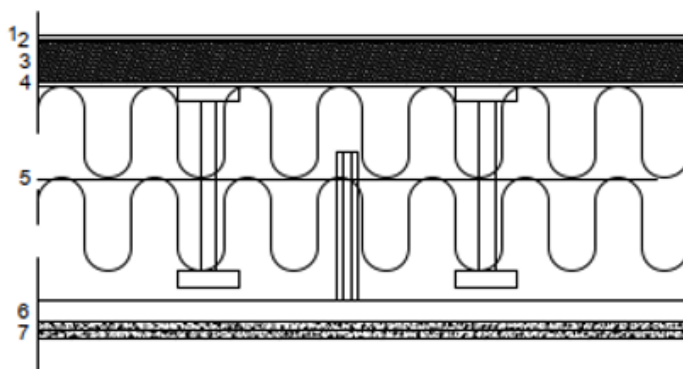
Reference floor 25. Diagram drawn in accordance with the floor type used in Chung et al. Study.
